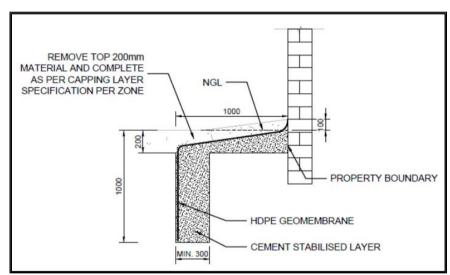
Typical cross-section of proposed rodent barrier (source: Walters, 2020)
